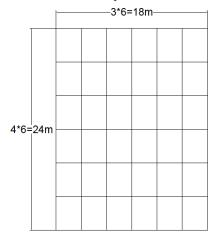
plan of G+20 Unsymmetrical building.The data required for analysis of building is in table 1.Table -1: Building configuration data
